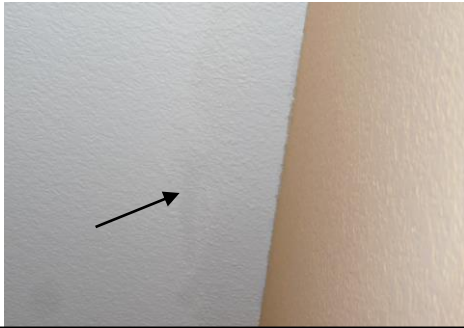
WATER MARKS AT ENTRY HALL/ LIVING ROOM
